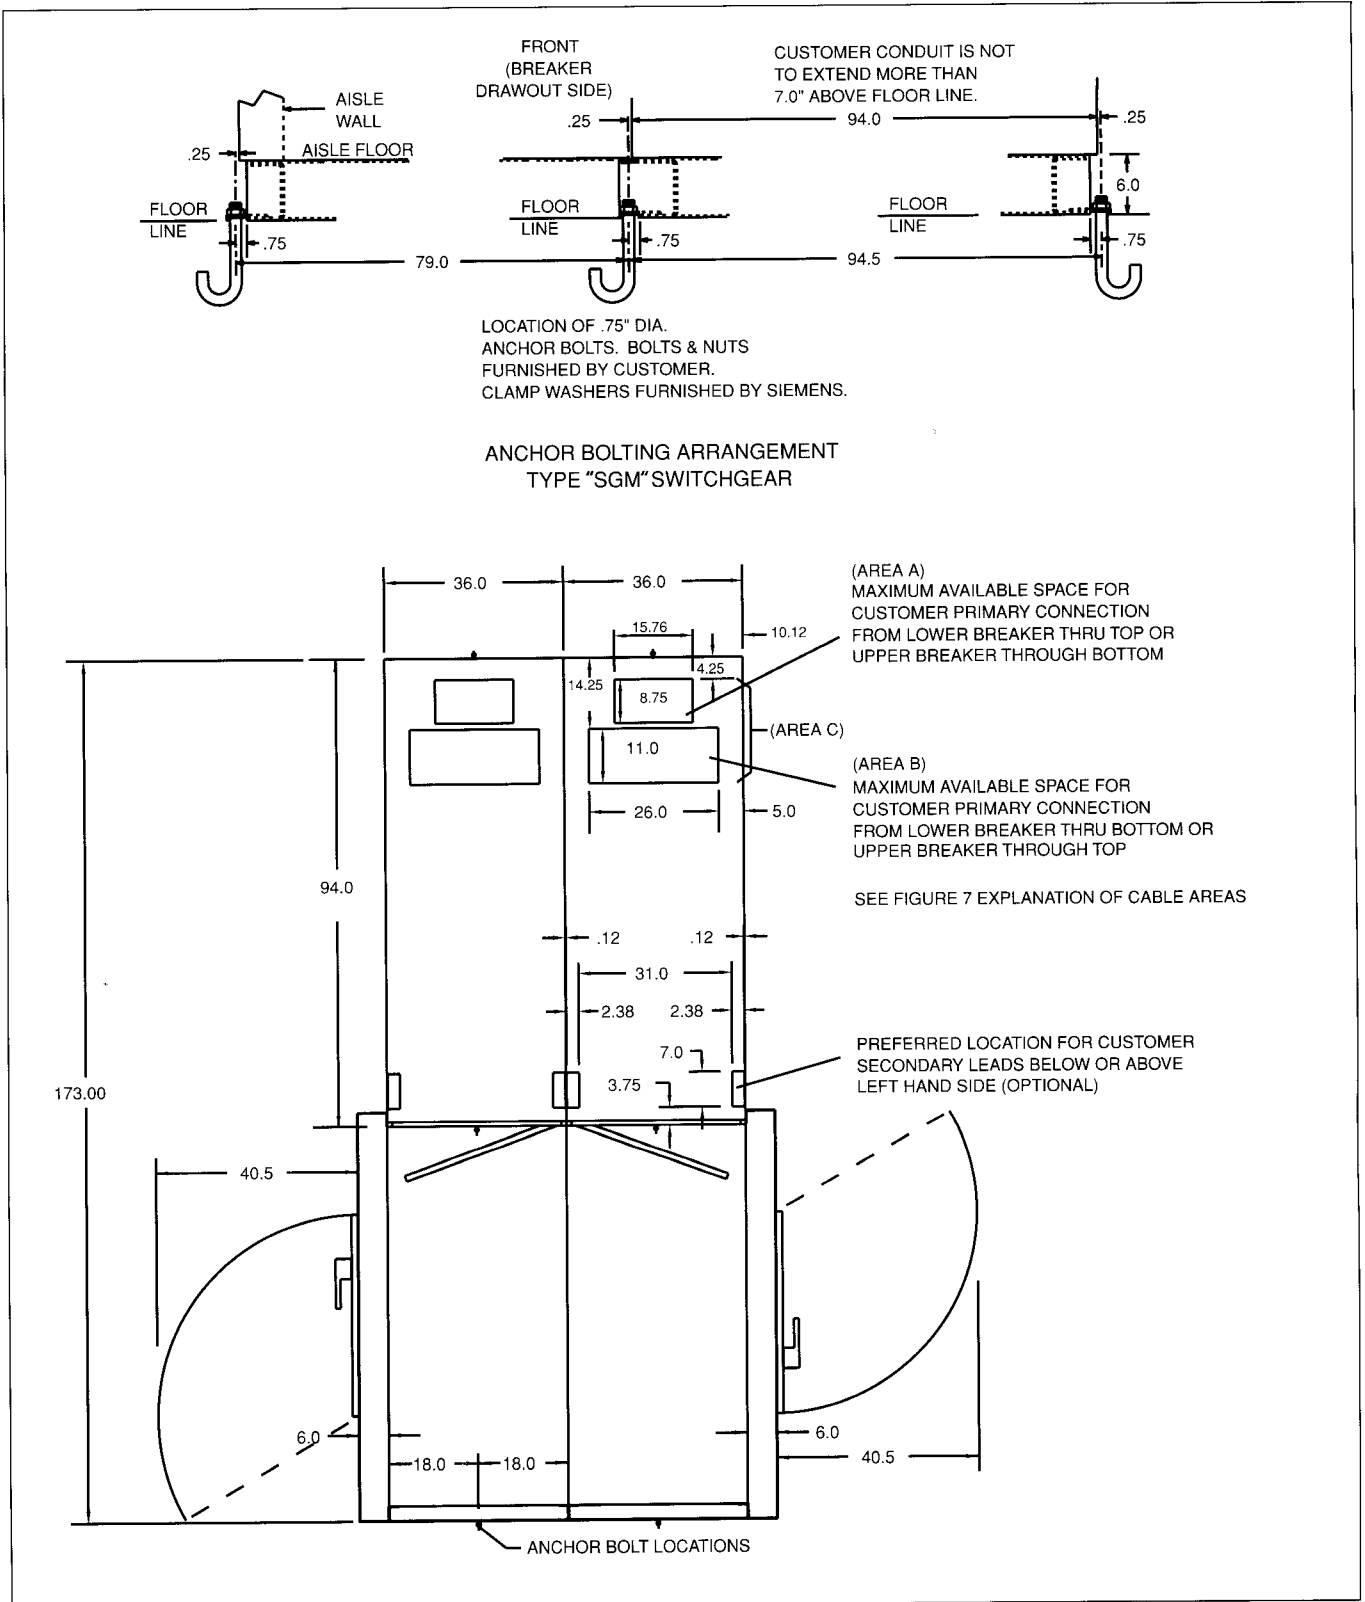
Anchoring Outdoor SGM Shelter-Clad (single aisle) Switchgear
